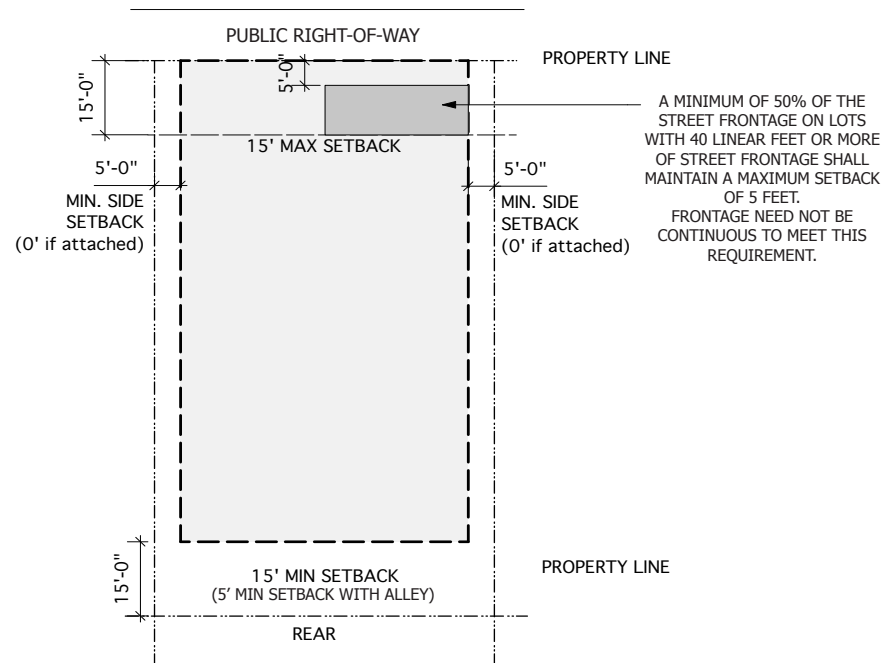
SU-2/VTVC BUILDING PLACEMENT DIAGRAM
